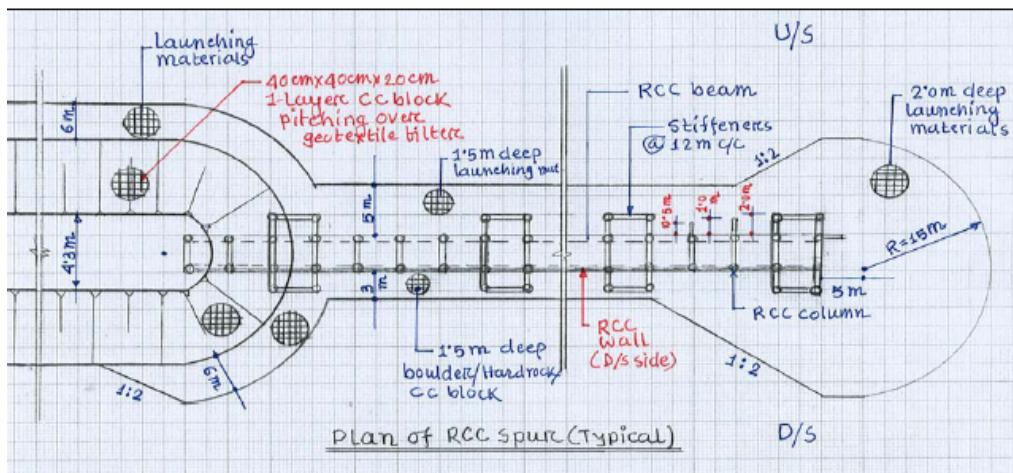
Typical Plan of a RCC groyne (Source: Uddin 2007)
